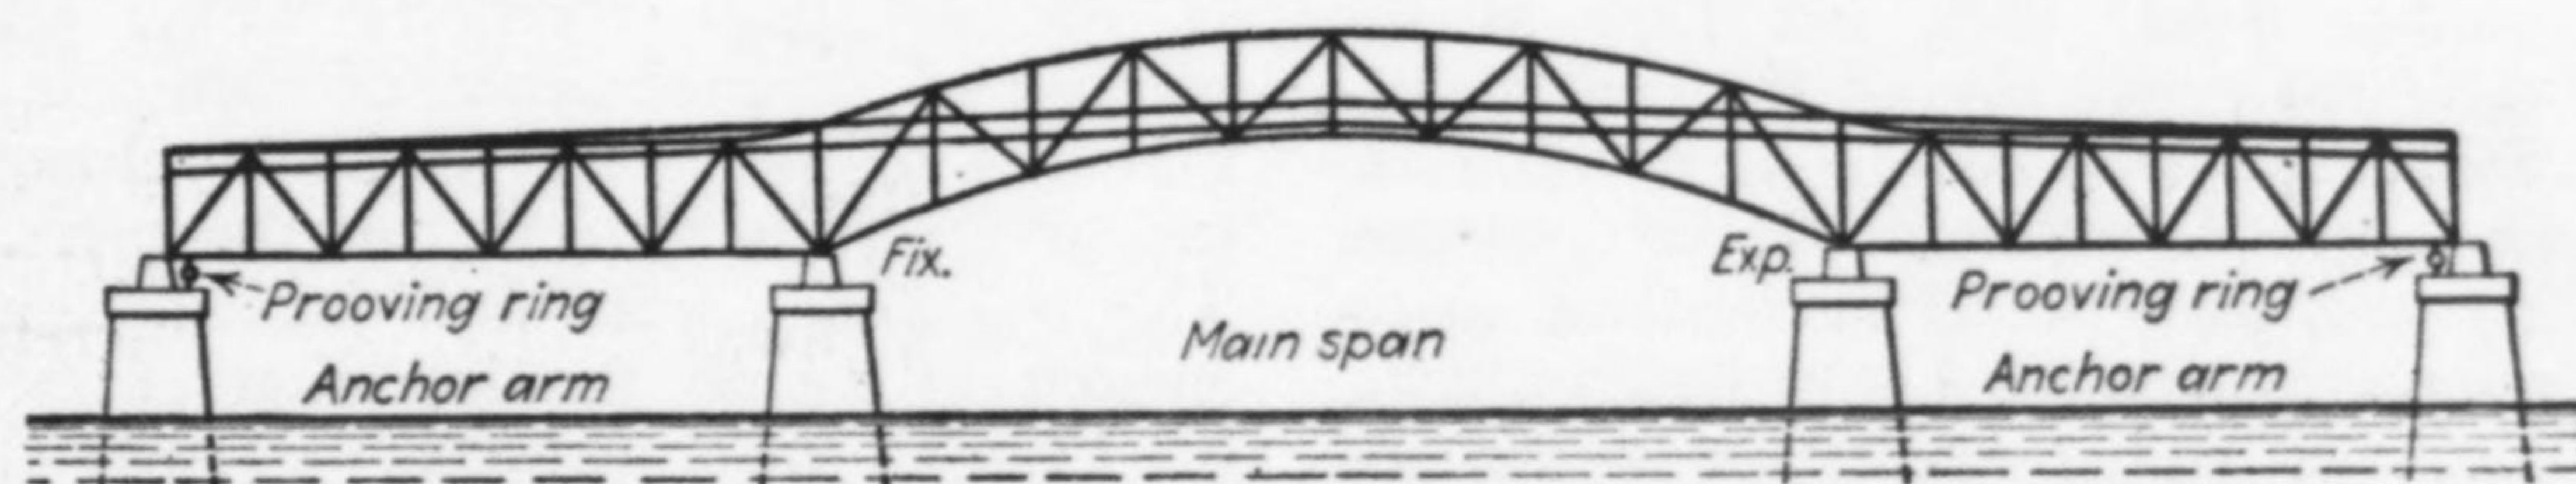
THREE-SPAN continuous-truss bridge with proving rings located so as to measure the reactions at both ends. Outline of Little Bay Bridge is shown. The Cape Cod bridges are similar except that the main span is a high arch with the roadway suspended beneath.
